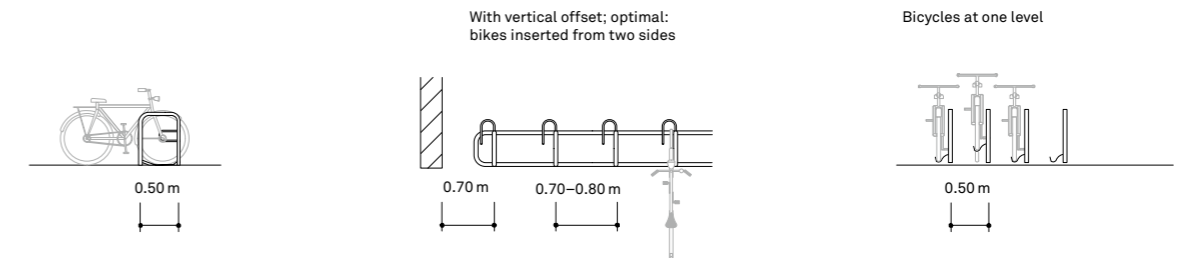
Dimensions and alignment of U-shaped racks with front wheel bracket, as multiple rack unit
